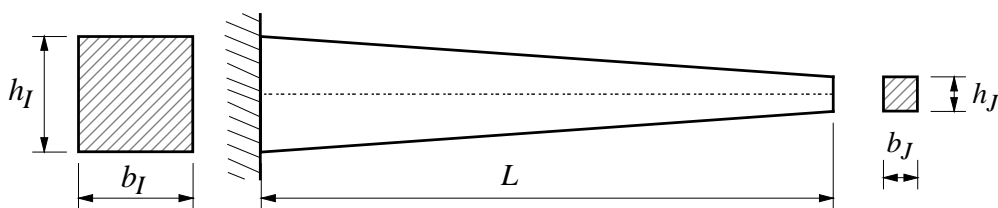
Example 1: straight cantilever beam with varying cross-section.
